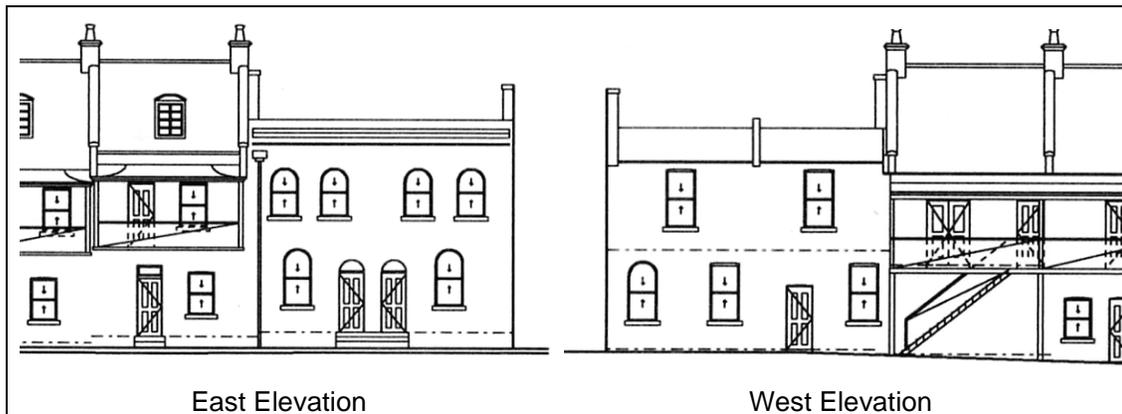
Building elevations (Source: Foreshore Authority, 2003).
